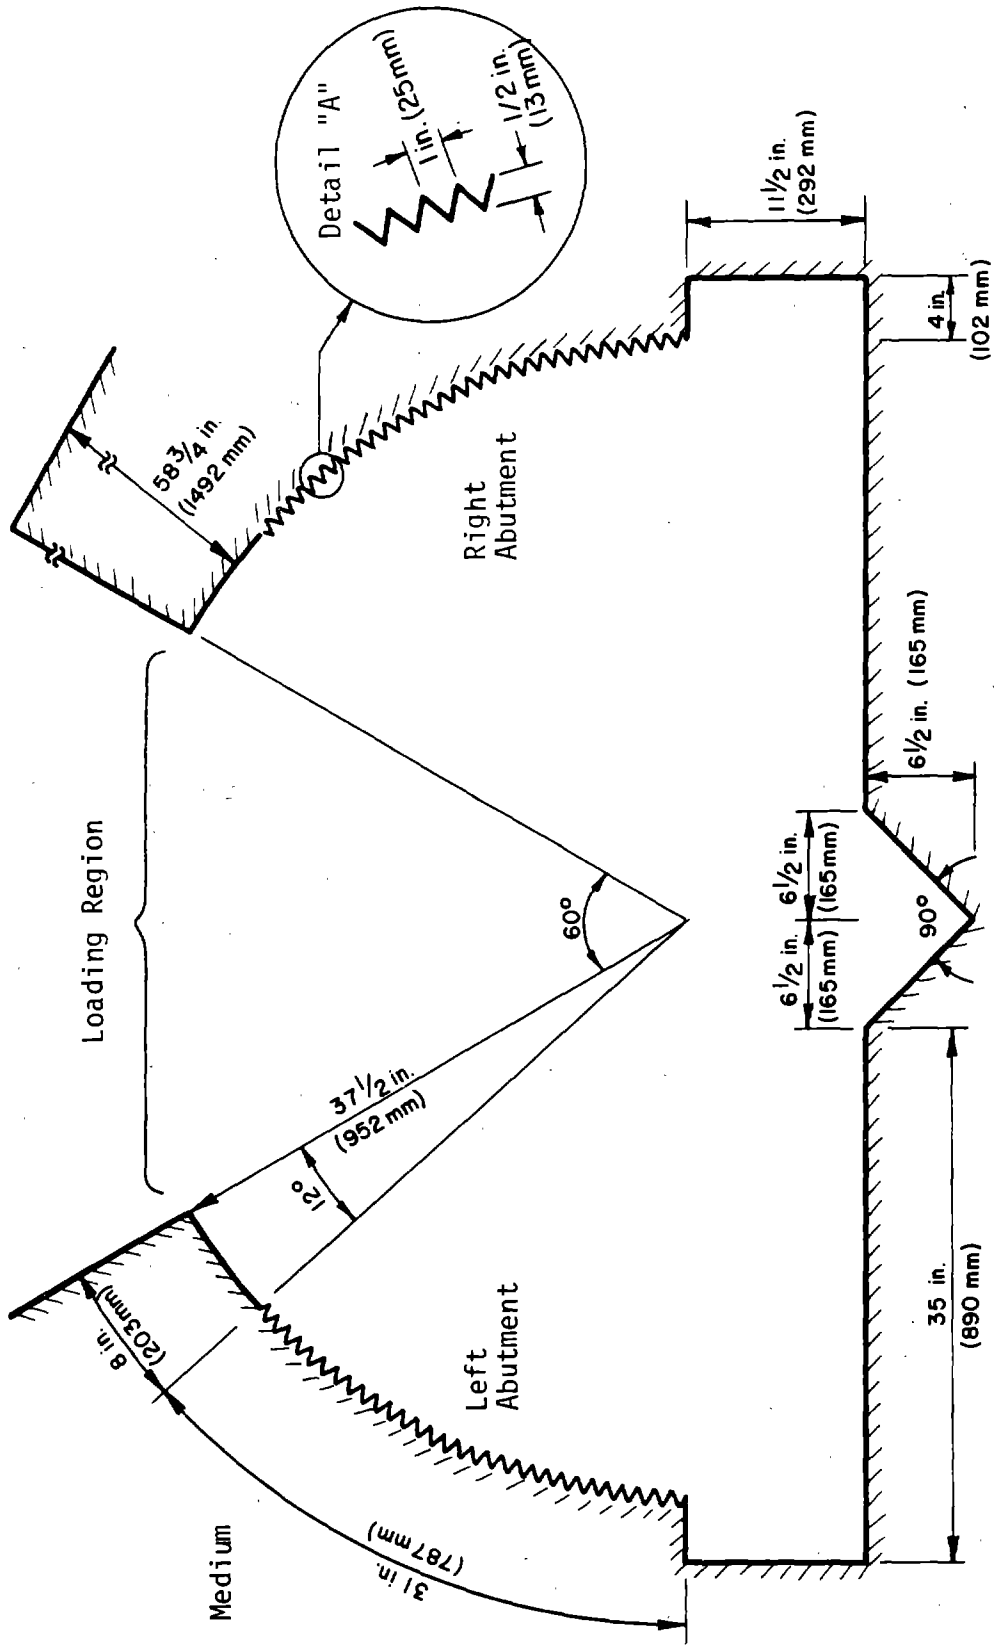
TOP VIEW OF THE TUNNEL OPENING
